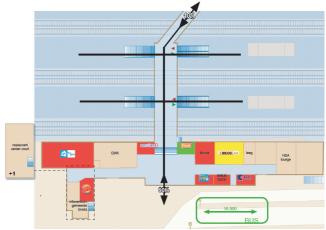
; Plan of station Breda (Source; ROP, NS Poort 2010)
